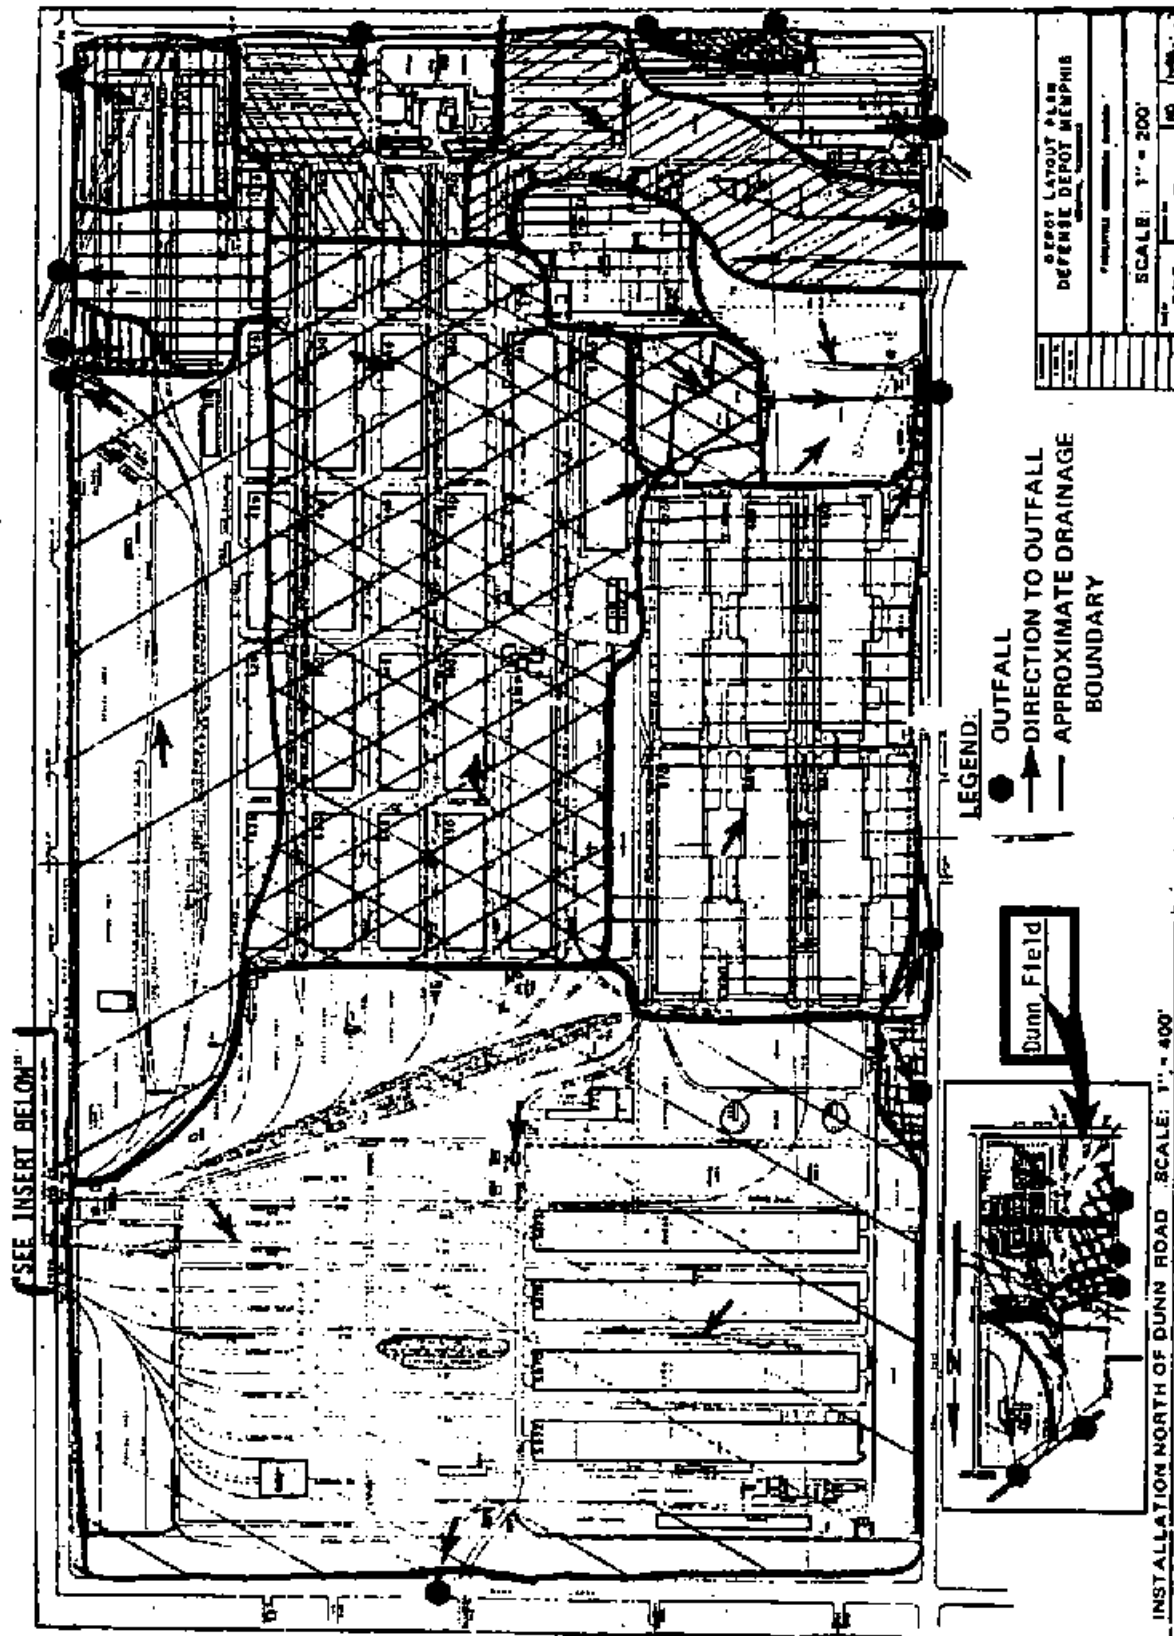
Storm Drainage Outfalls and the General Drainage Area of Each Outfall
